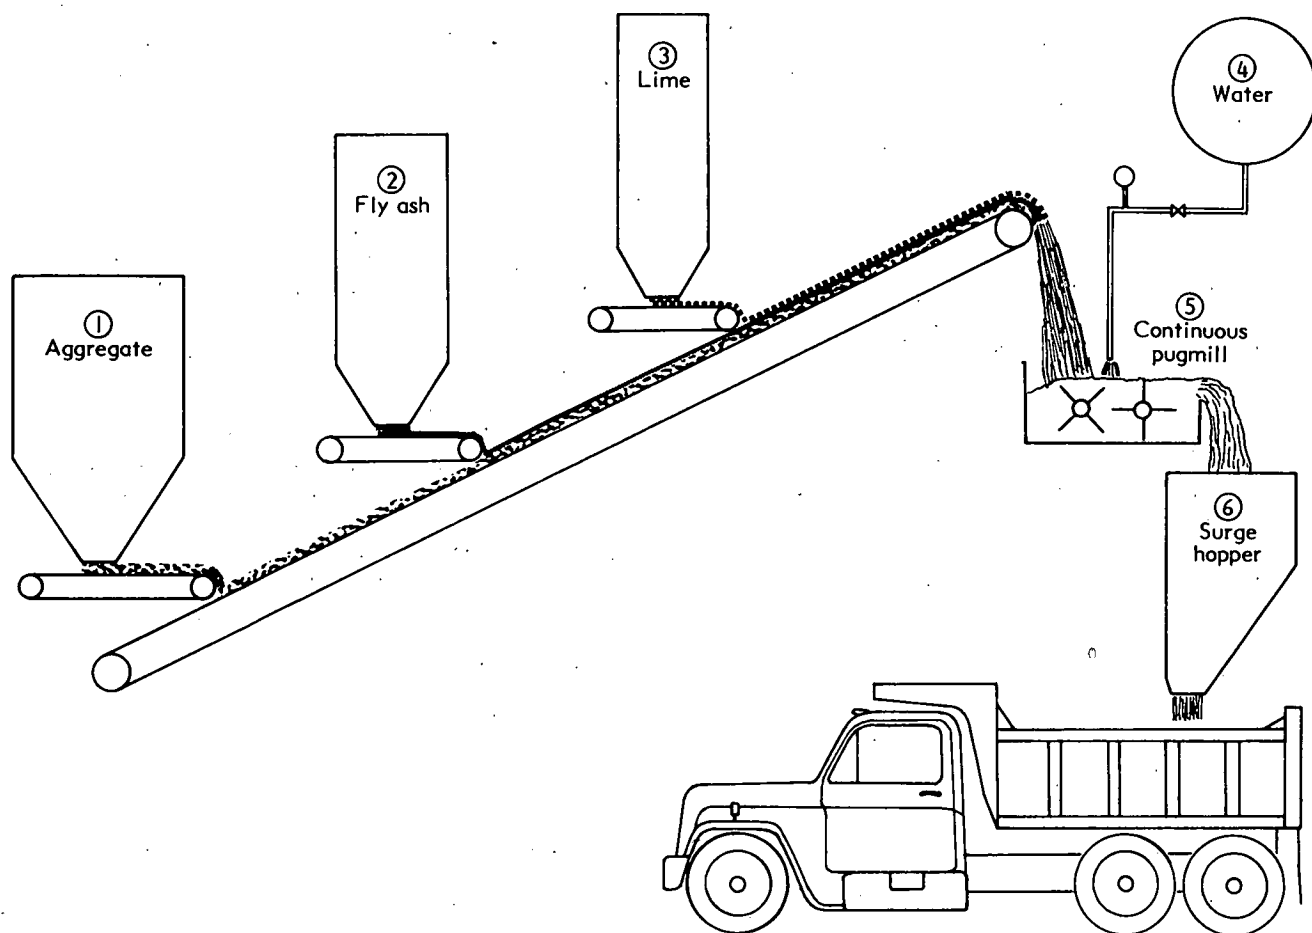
Schematic diagram of typical plant layout for LFA mixes.
